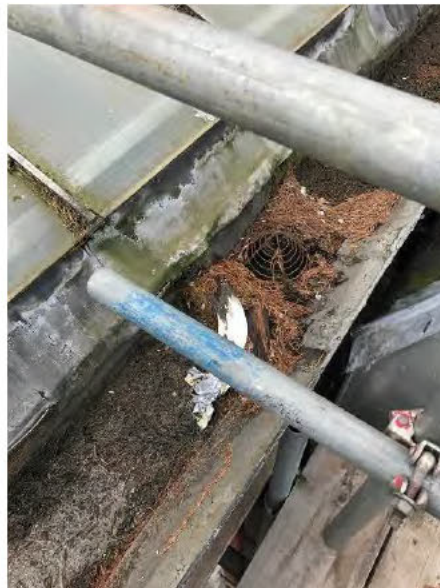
Roof structure cast iron guttering outlet full of debris.
